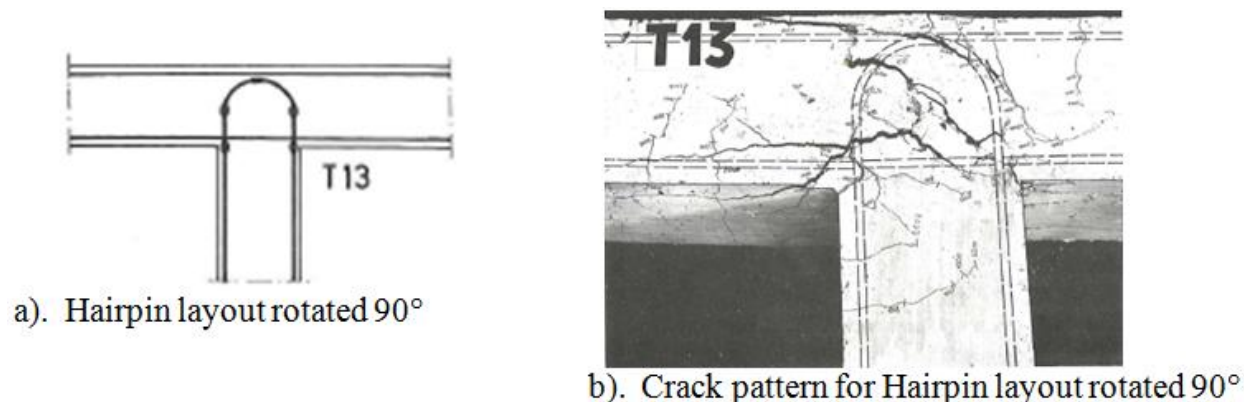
Hairpin reinforcement layout for T-joints (Nilsson, 1973)
